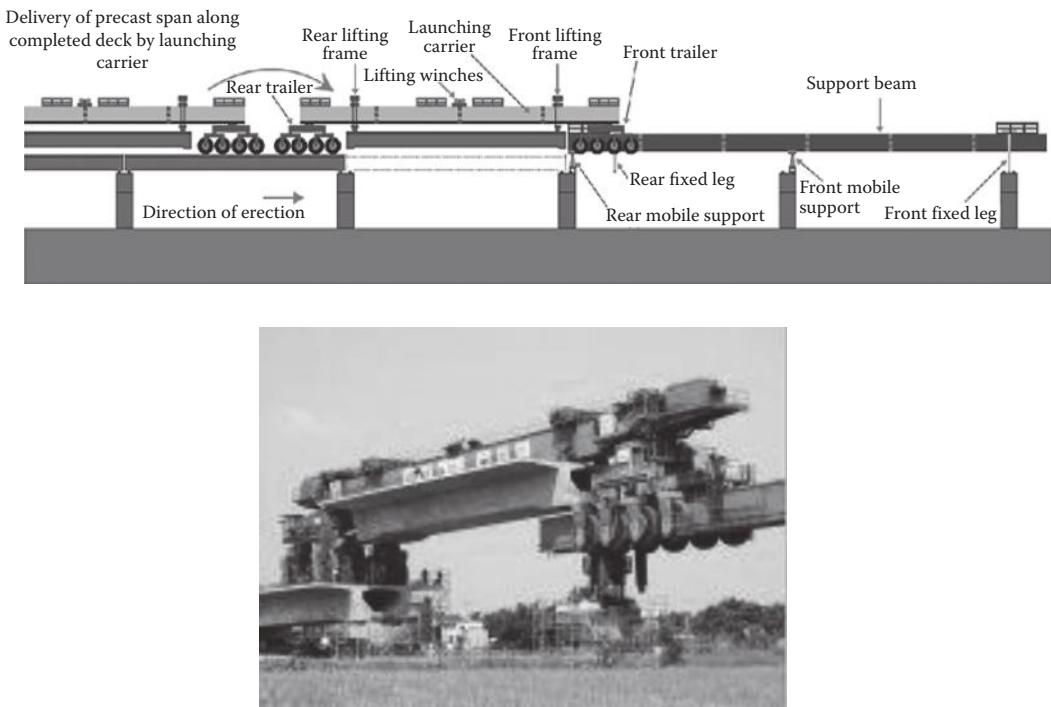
Example of full-span precast method. (From VSL. *Bridge Construction Partner*, VSL International, Küniz, Switzerland, 2013.)
